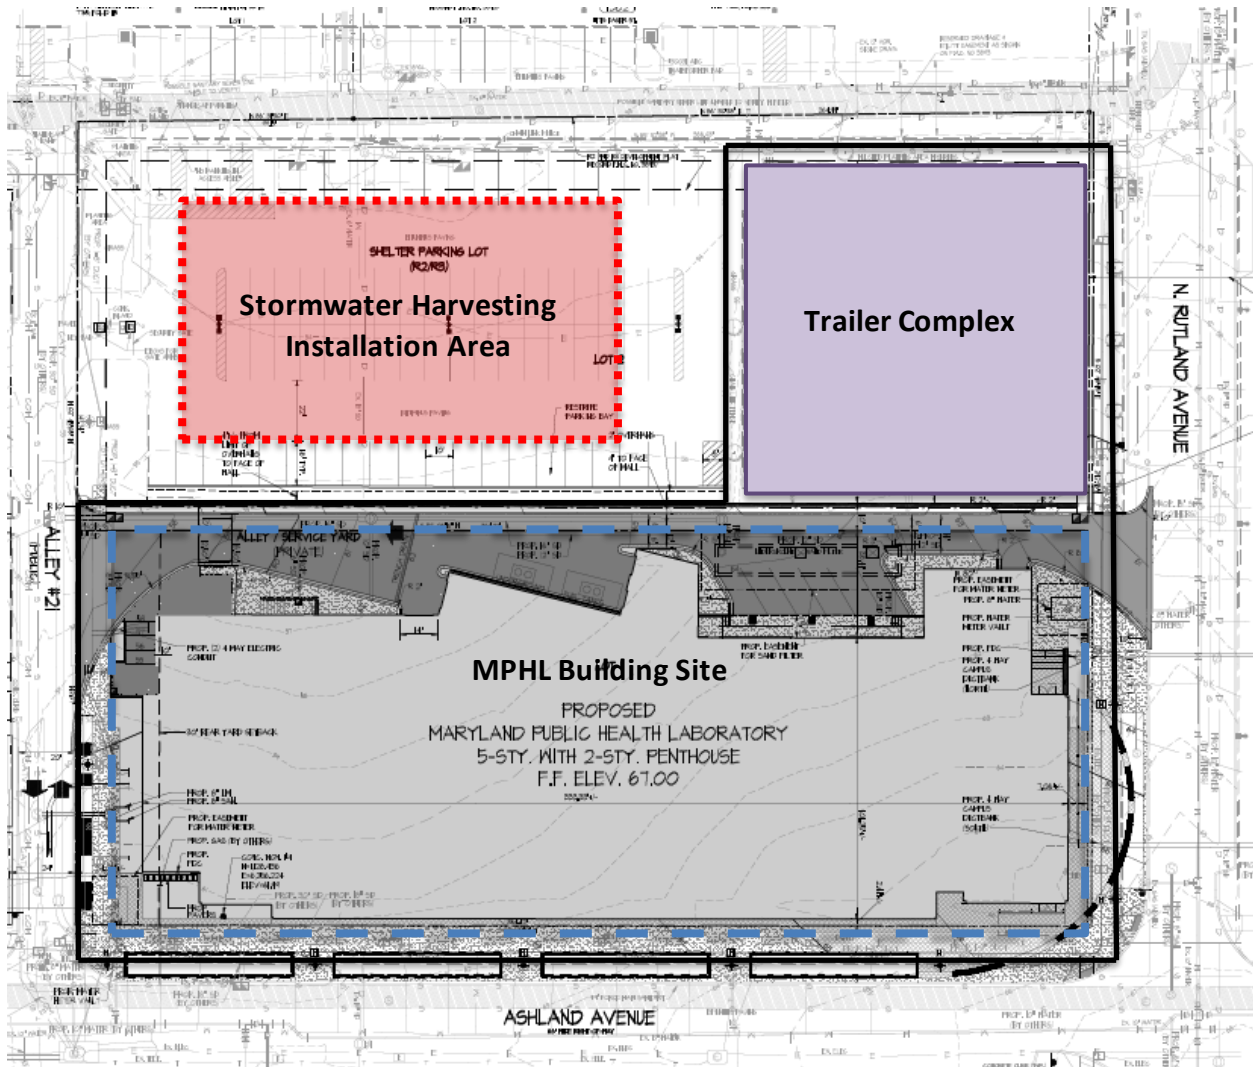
Stormwater Installation Map (plan provided by HDR, Inc.)
